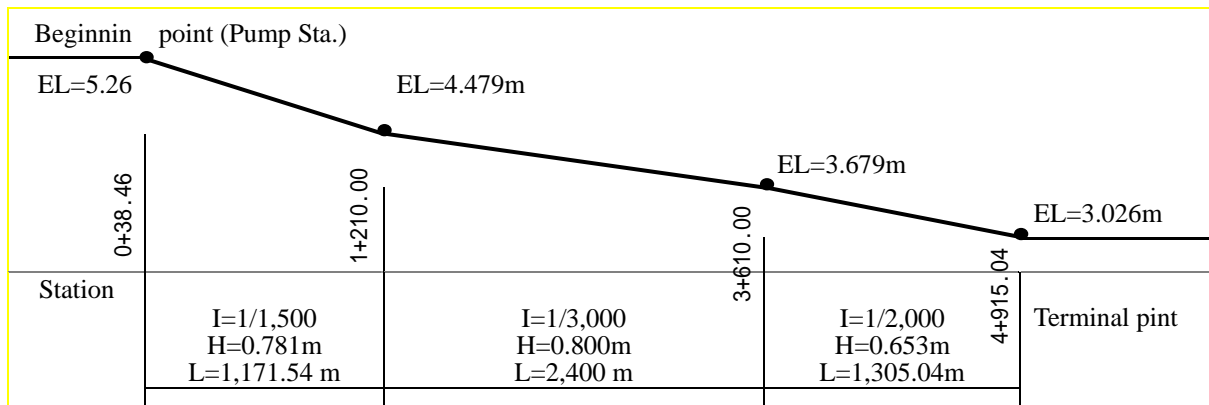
Planned Long Section of Nam Trung Canal
